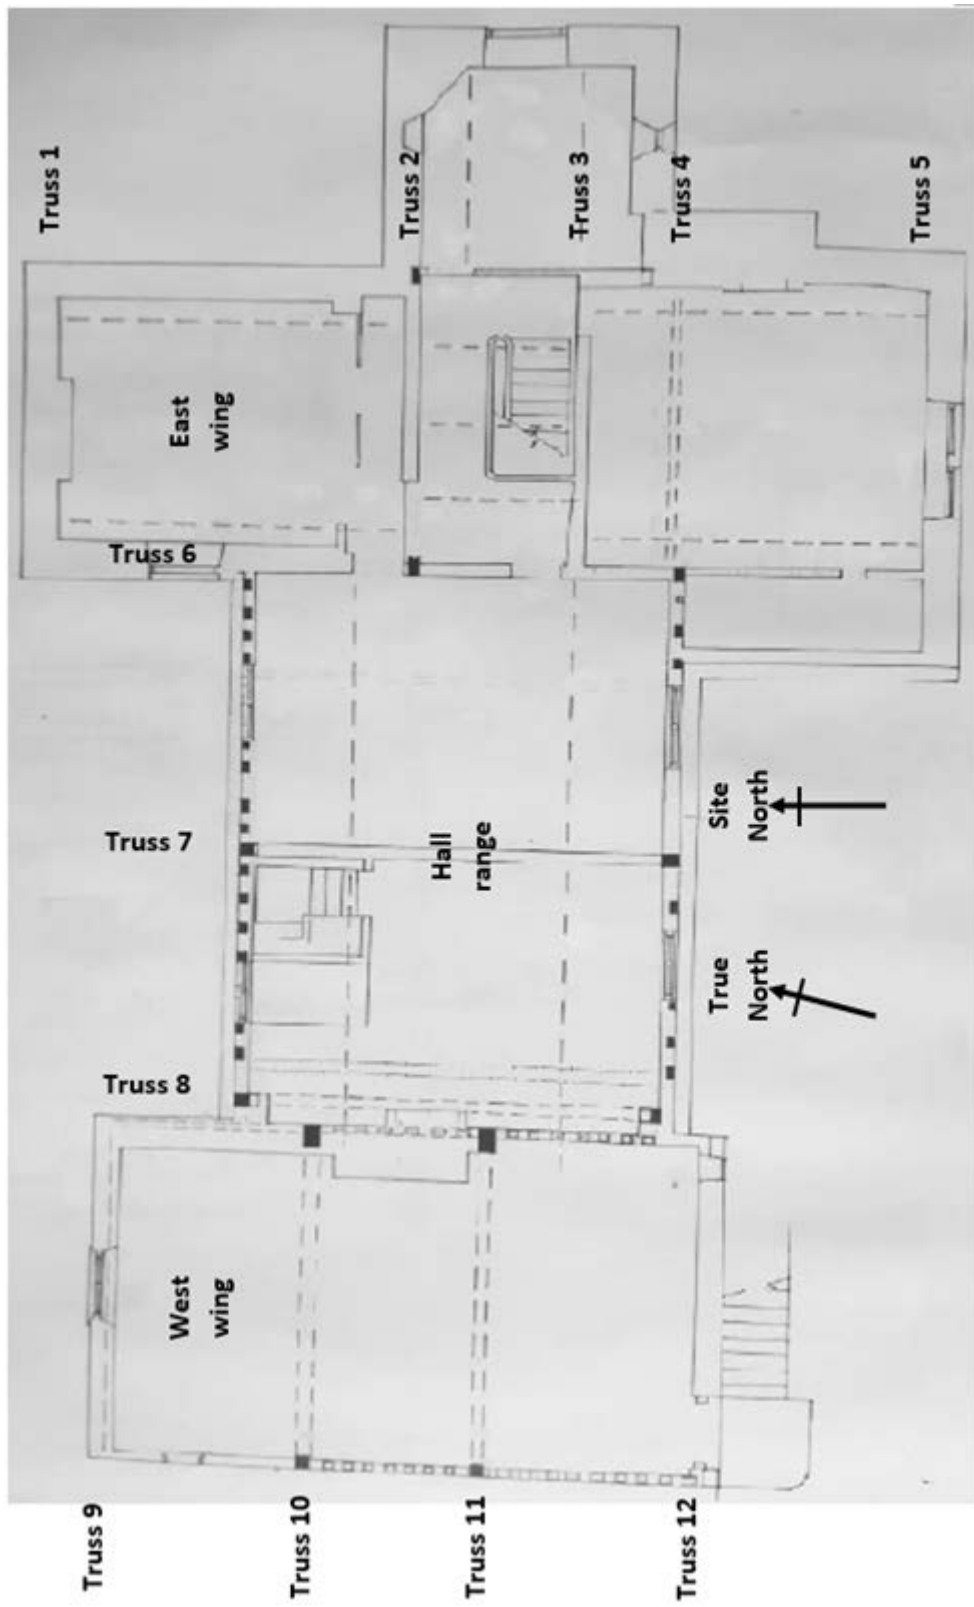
Plan to show layout of Oughtibridge Hall and the truss positions (after Jones 1994)
